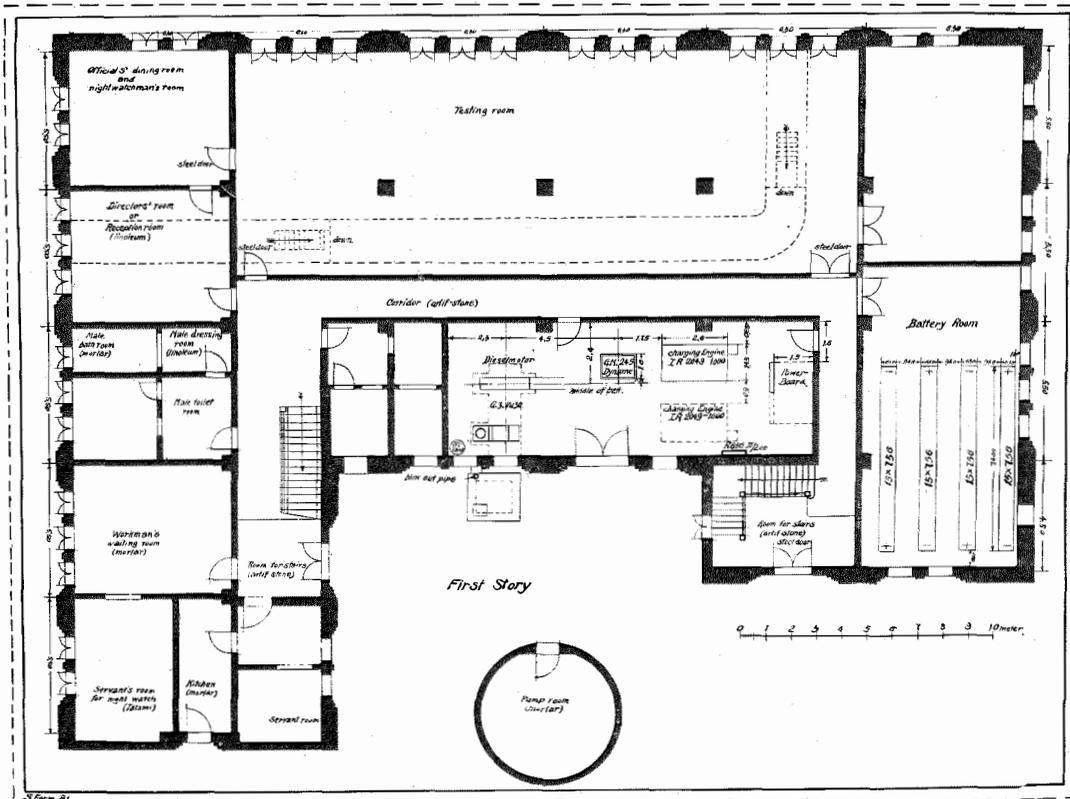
Plan of Building with Equipment, Honkyoku, Yokohama
